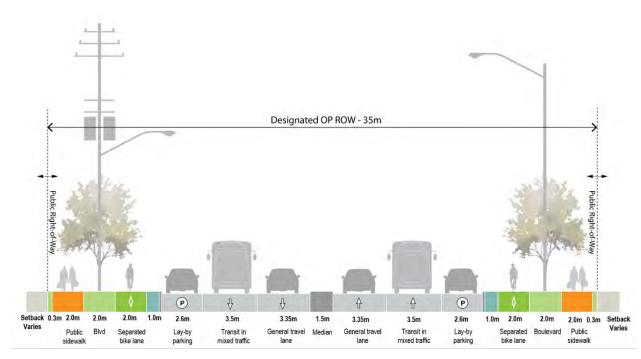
Preferred ROW Alternative (Segment 2B: CN Railway Crossing to Clarkson Road South)
